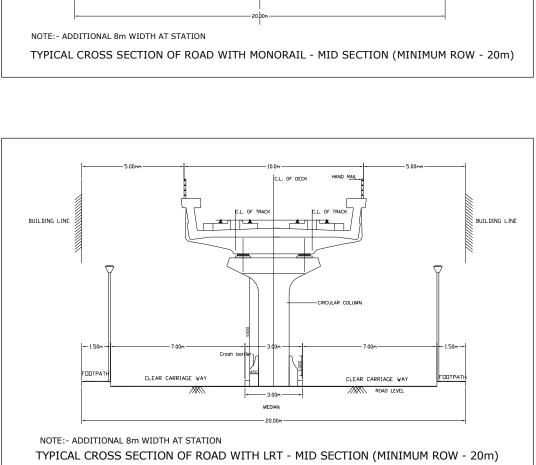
Typical Cross-Sections of Road with Elevated LRT and Monorail
